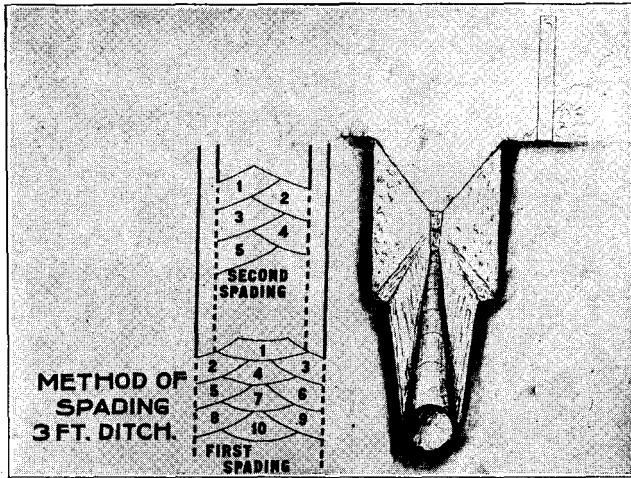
Plan of First and Second Spading and Sectional Perspective for a 3-Foot Ditch for Small Tile
